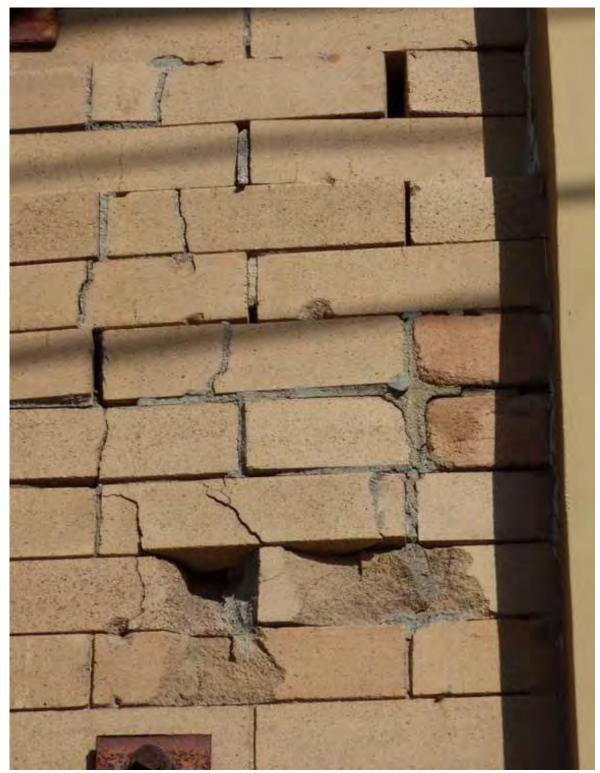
Cracked and damaged brick on front façade, with chunks of brick missing, view north (PCR 2015)
